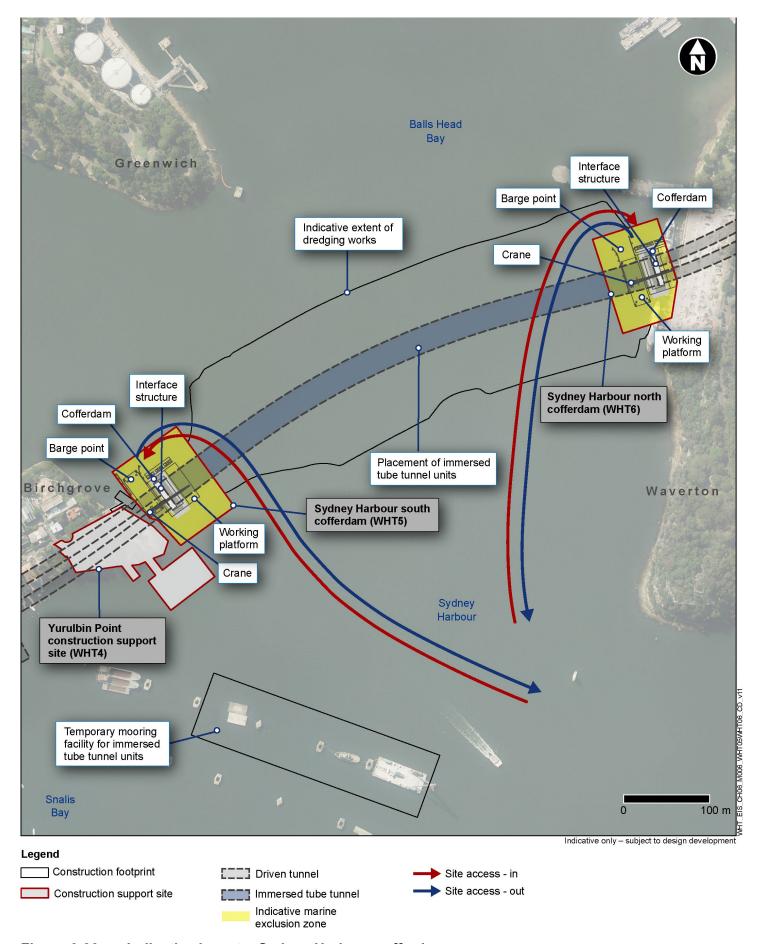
Indicative layout – Sydney Harbour cofferdams
